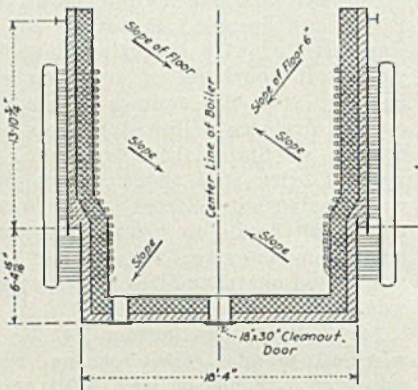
Plan view of furnace bottom with floor sloped 6 inches in direction of tapping hole
